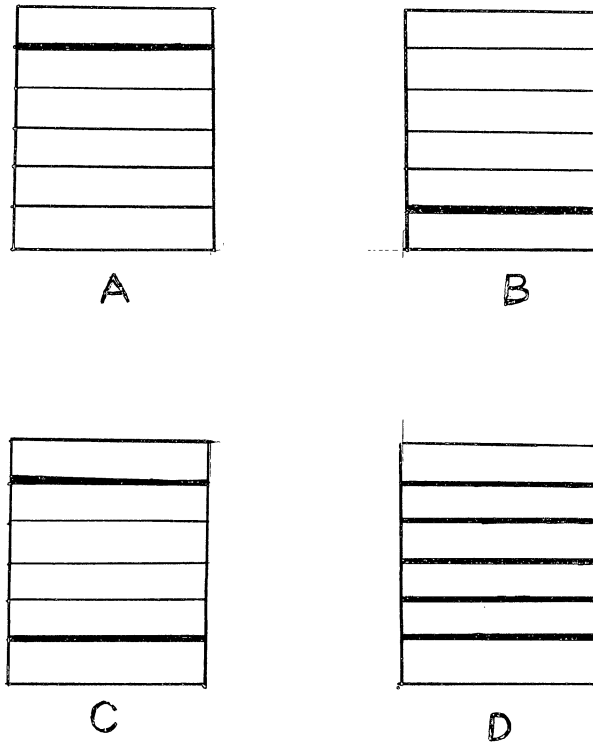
FIGURE I. CROSS SECTIONS OF THE REINFORCED
